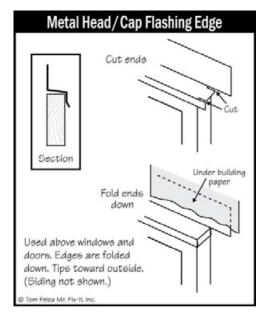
Wall Flashing – Water Flow Fundamentals)
